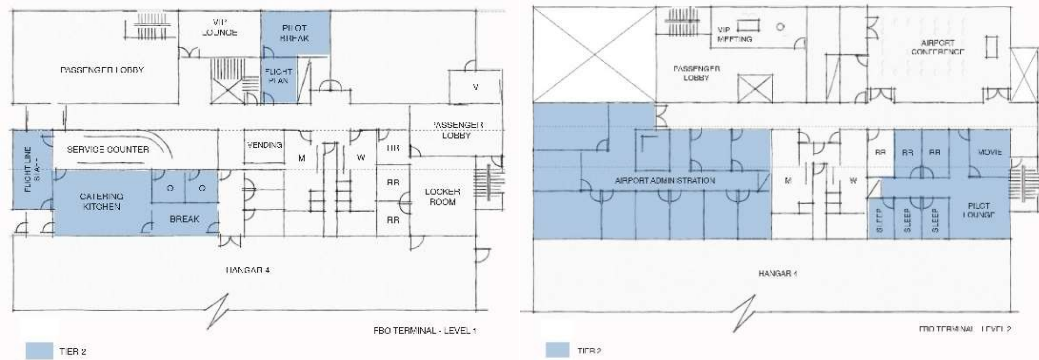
Tier 2 Key Plans (First Floor & Second Floor)
